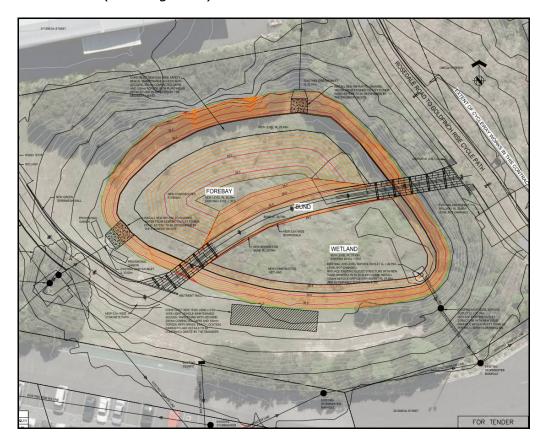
Showing Design Layout of Omega Pond Showing Cycleway
